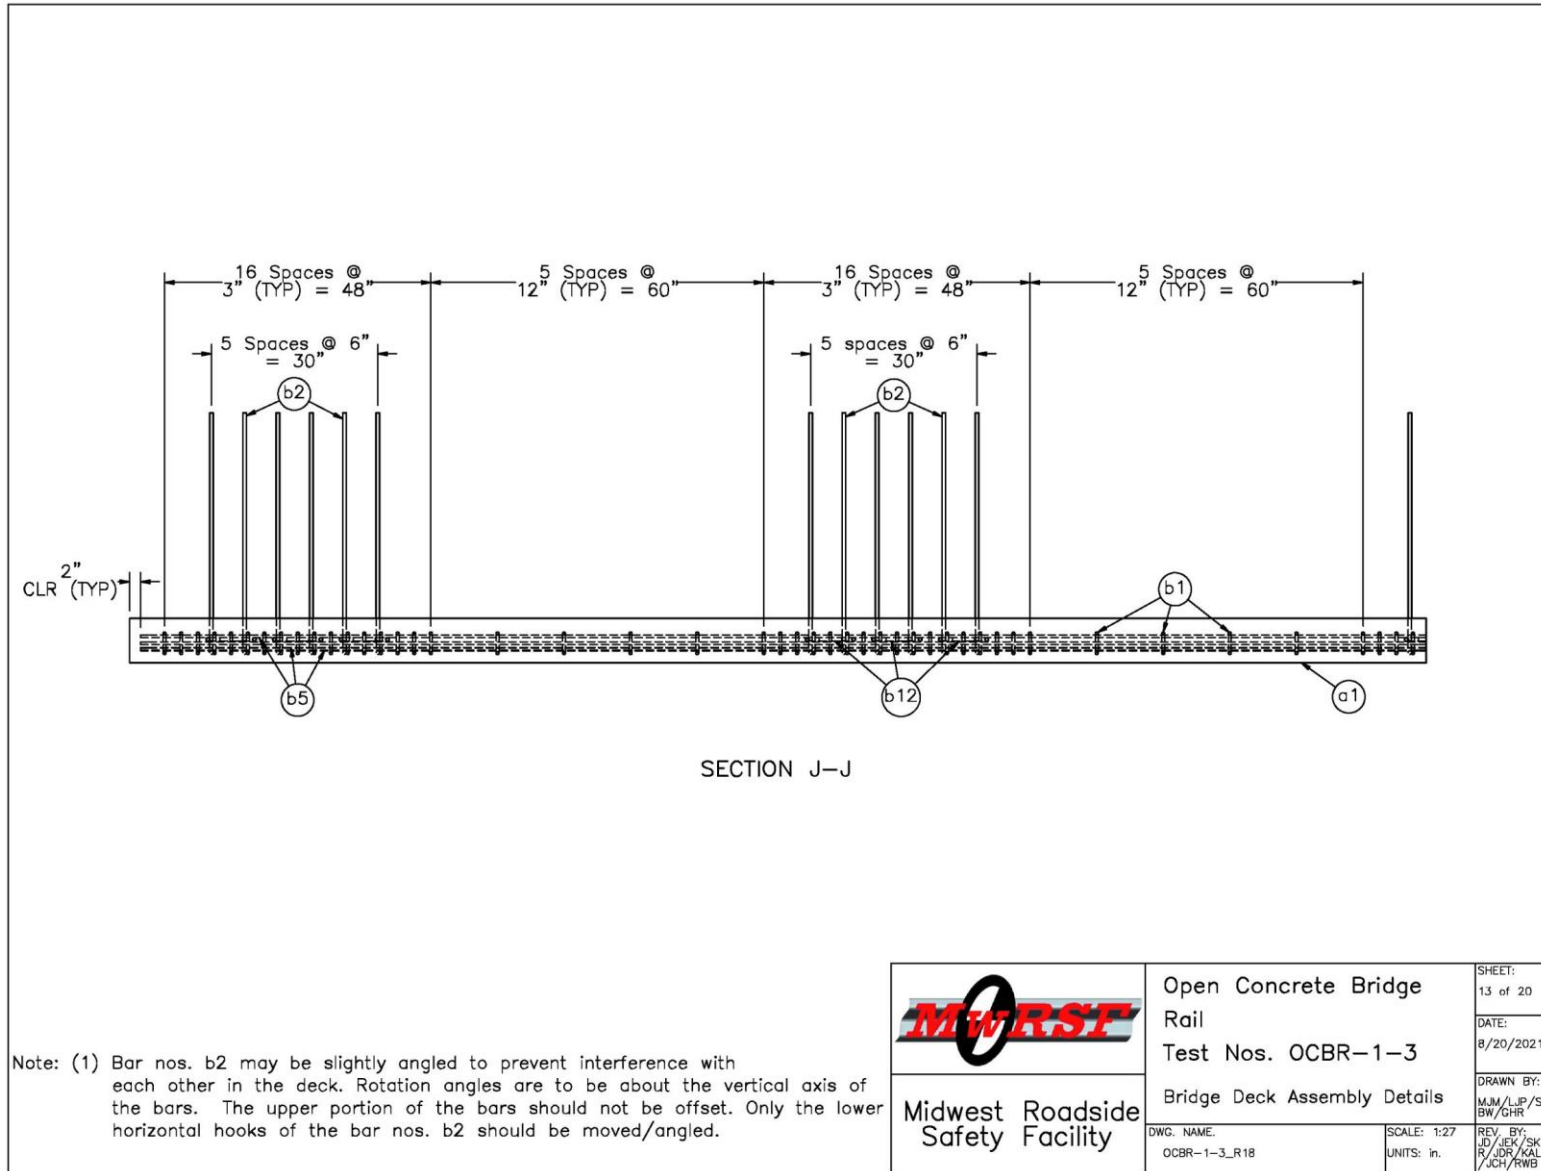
Bridge Deck Assembly Details, Test Nos. OCBR-1, OCBR-2, and OCBR-3
